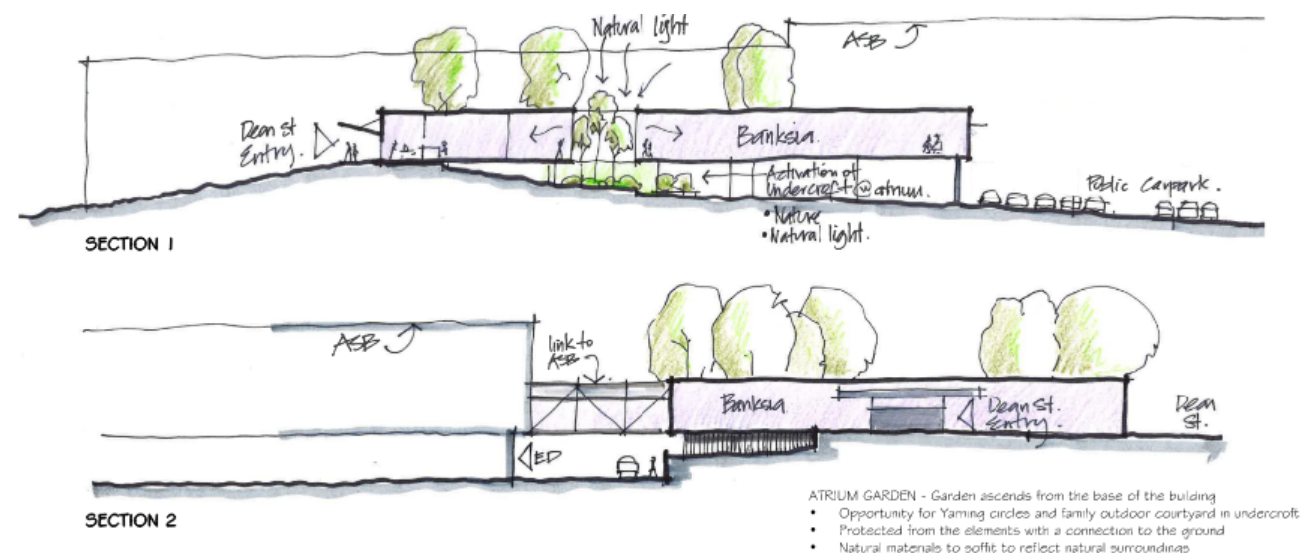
PROPOSED NEW TAMWORTH MENTAL HEALTH BUILDING SECTION
